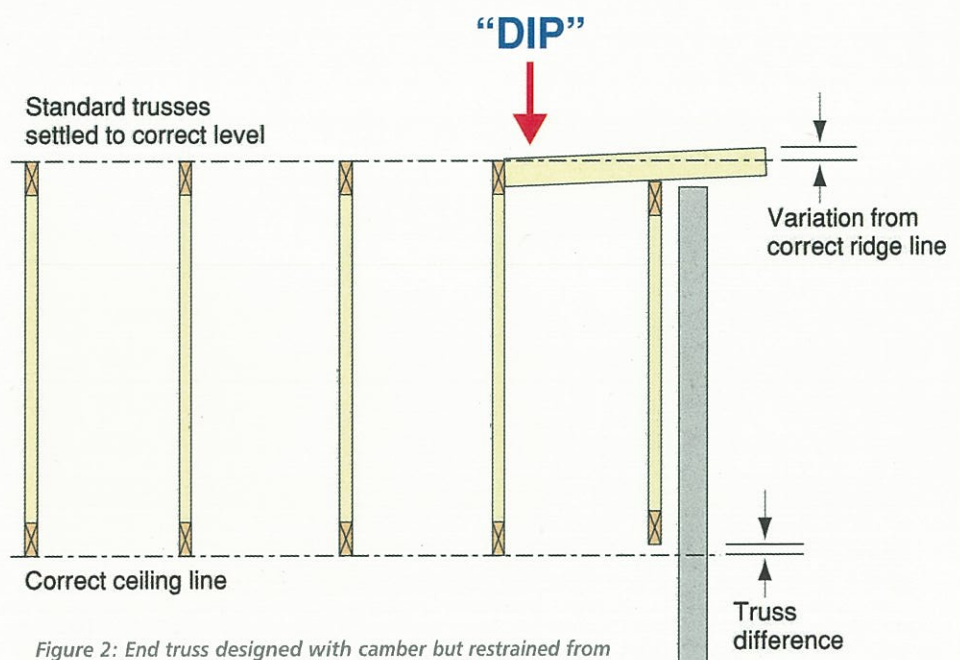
End truss designed with camber but restrained from settling by propping off end wall or solid fixing to gable studs/brickwork.
